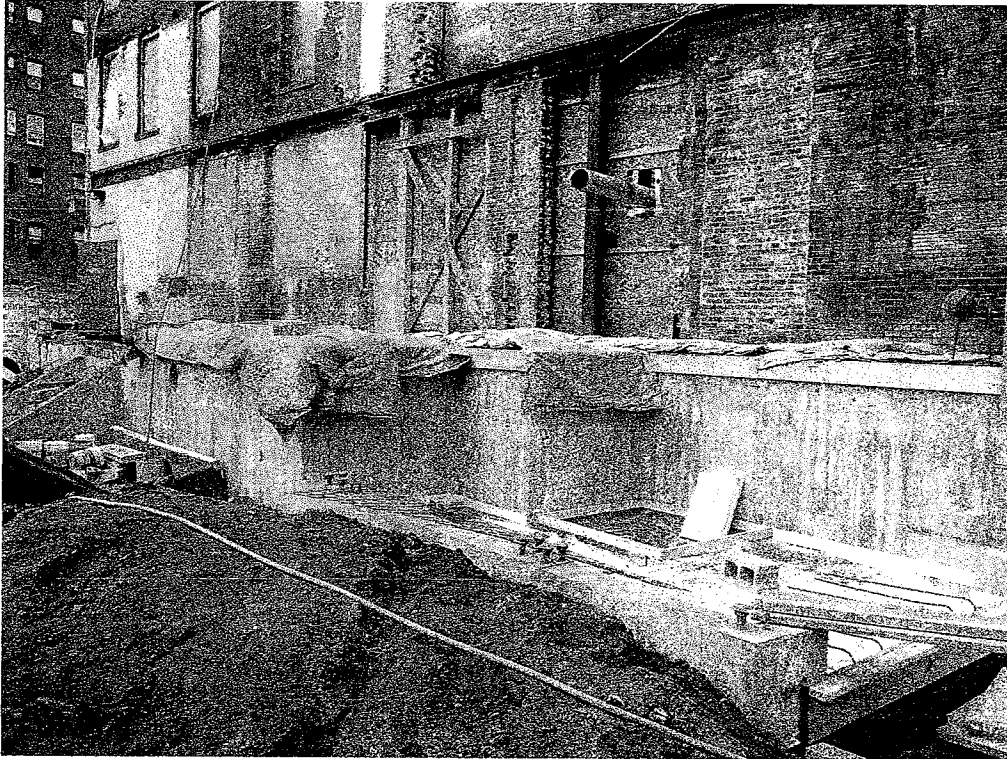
Concrete blankets used to protect freshly placed slab during cold weather (photo taken on 10/29/09).
